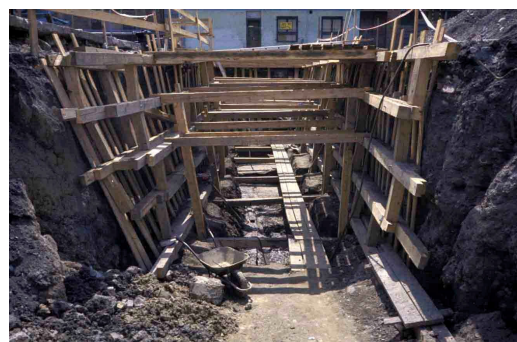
Excavating in deep: the foundations of future buildings can destroy archaeological sites (photo of the author)
